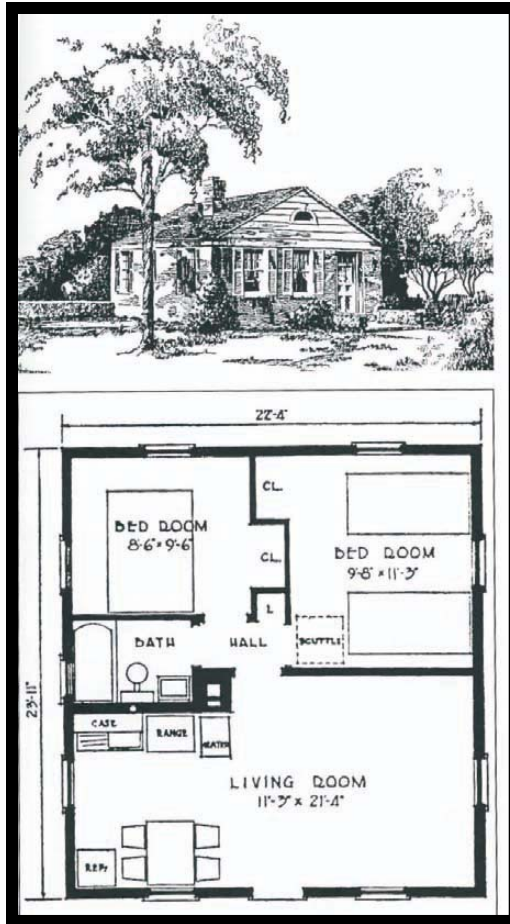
House Type A Elevation and Floor Plan published by the Federal Housing Administration in 1936 (Ames and McClelland 2002:61).
